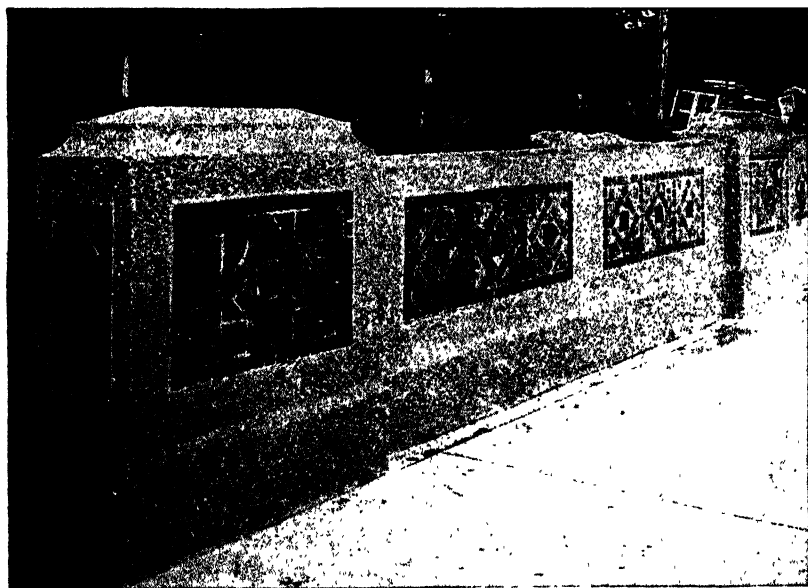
Bridge Parapet of Scrubbed Concrete. (See p. 264.)
